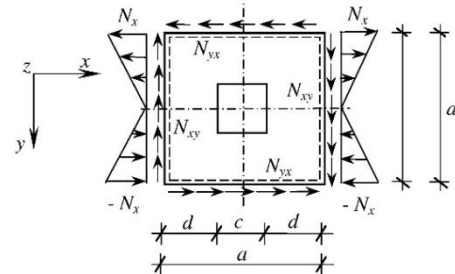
Considered element of the steel welded girder with square hole
